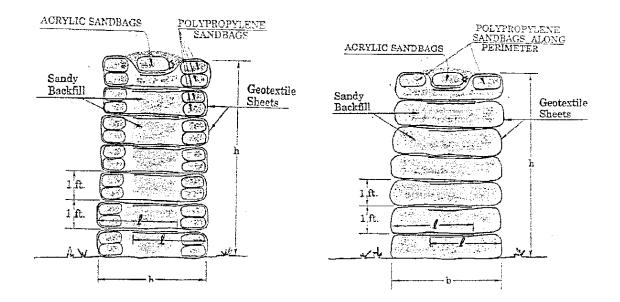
FABRIC FOLD-BACK WALLS
